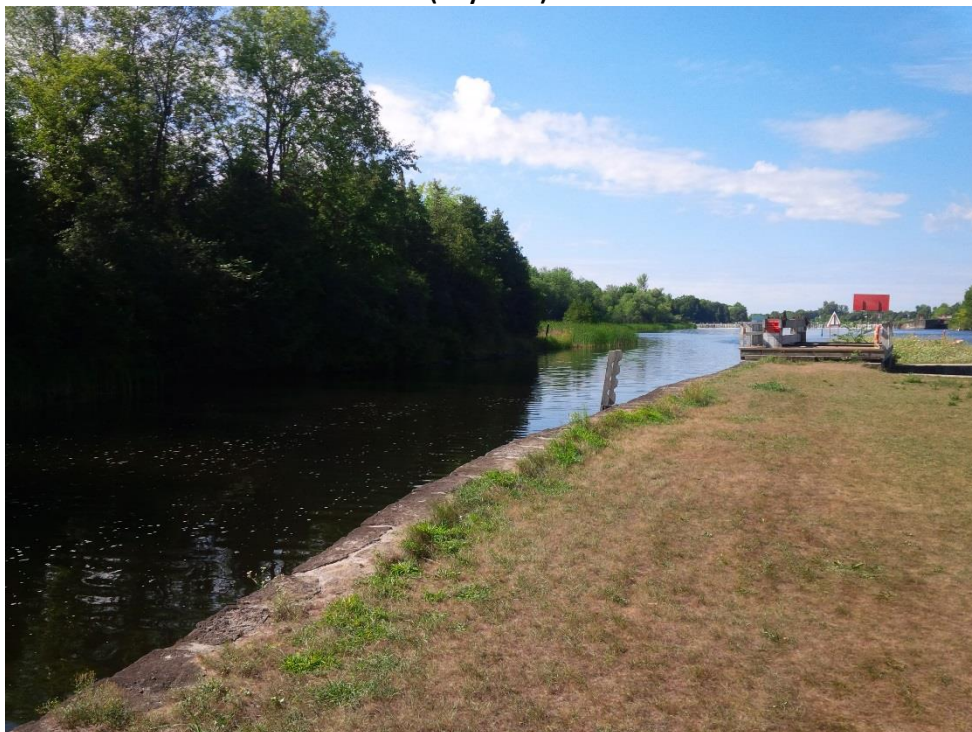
View of earth dam, masonry/concrete wall and waste weir at Upper Nicholsons (July 2016).
